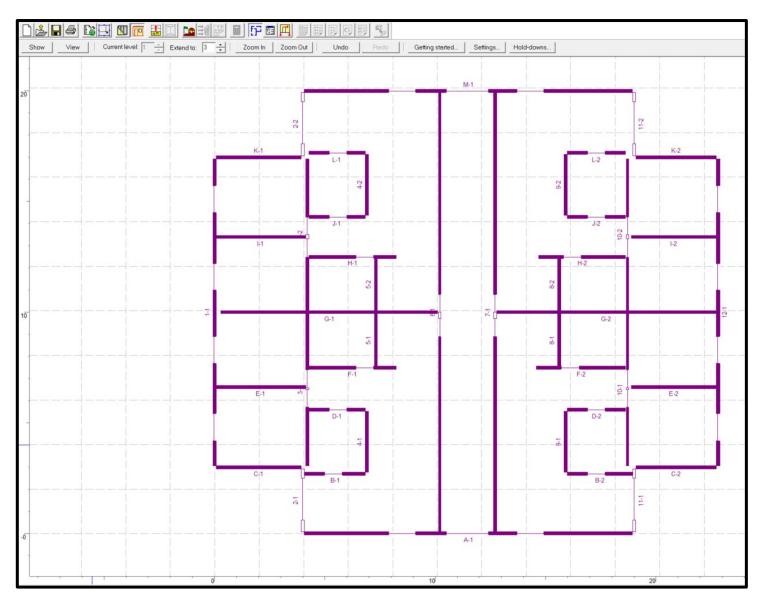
Shearwalls Tutorial 6 – Level 1 Door and Window Openings (Without CAD Drawing)
